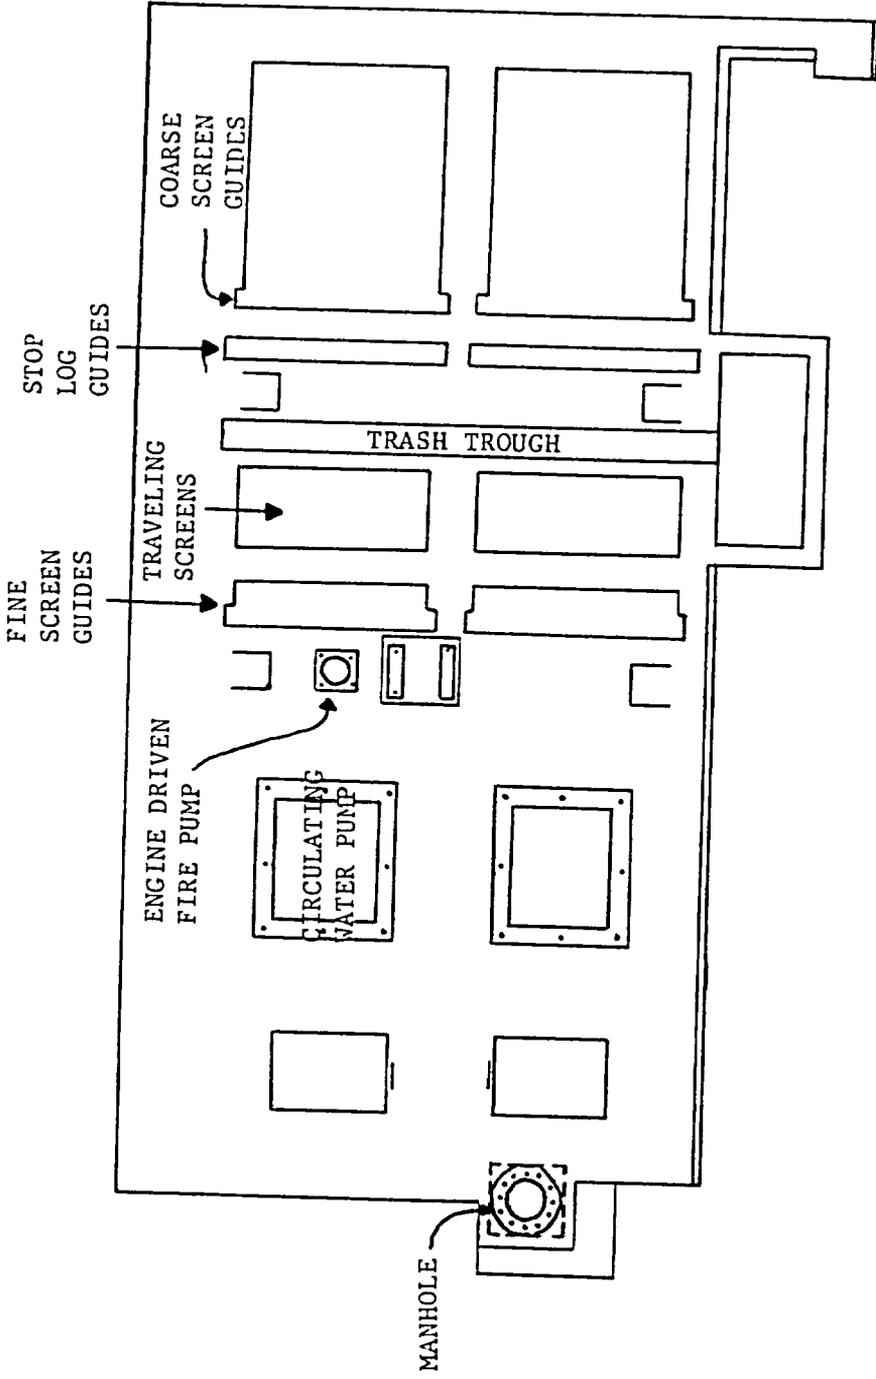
Intake structure, Unit 1, plan view
